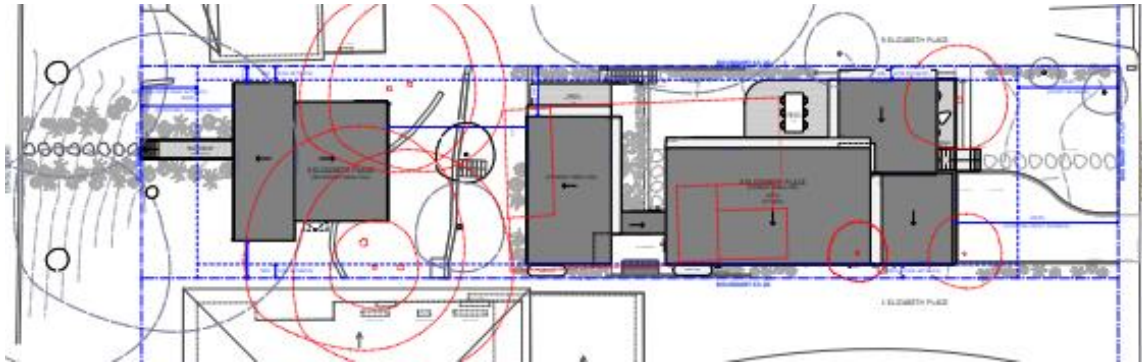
Site Plan (source - Adriano Pupilli Architects)
